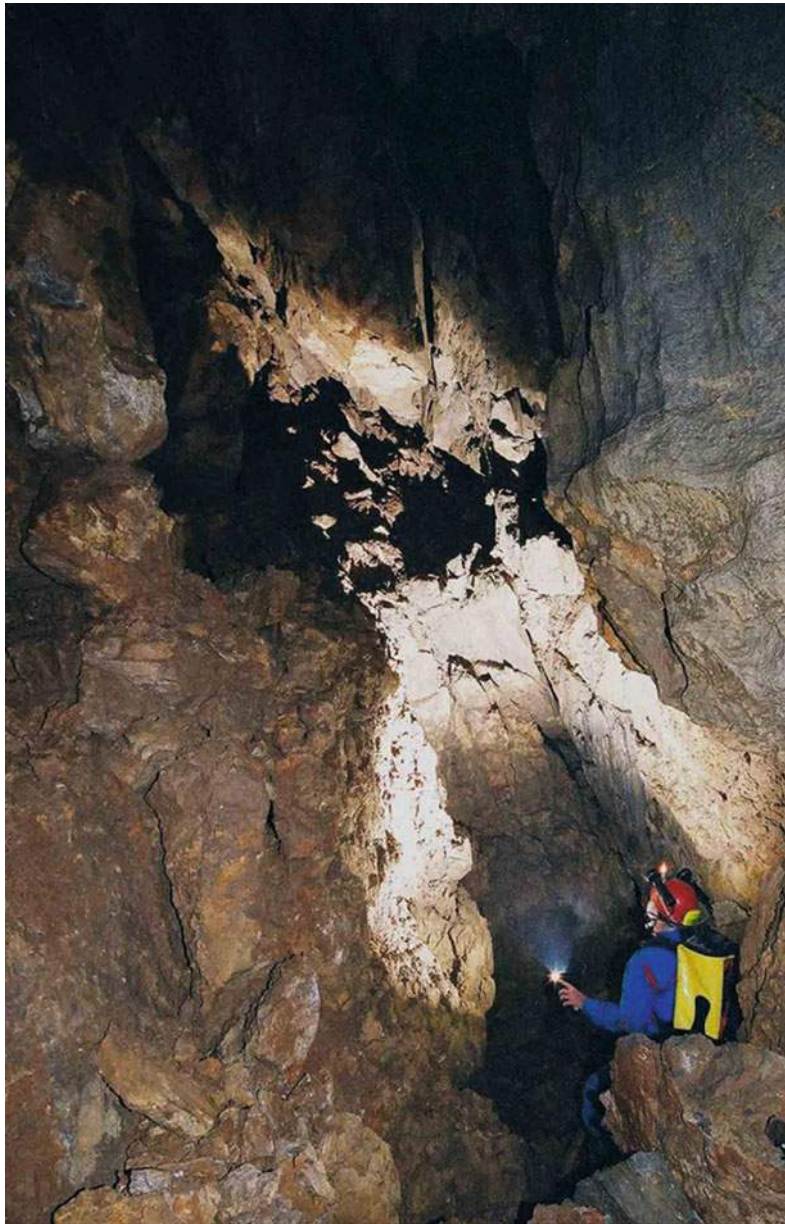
Cavern at km 14 + 229 on A-1 highway, Josipdol—Mala Kapela Tunnel section
